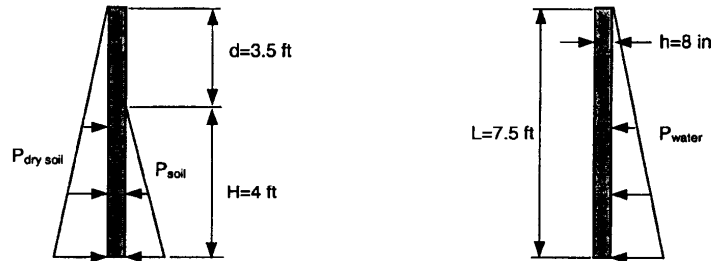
Lateral earth and water pressure acting on a retaining wall.
